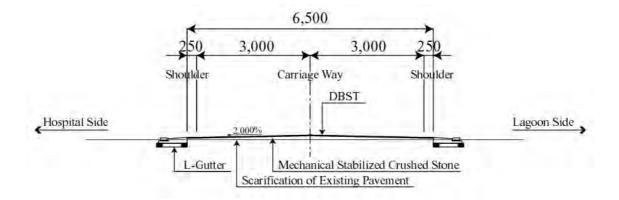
Standard Cross-Section: South Tarawa Road in Bikenibeu
